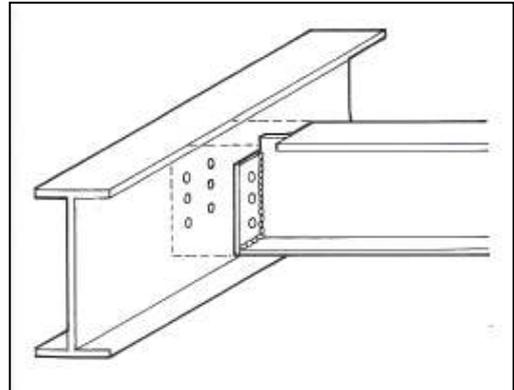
Beam-to-girder connection using a welded end plate
